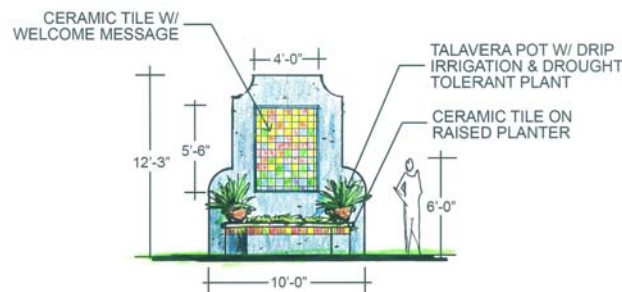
SMALL ENTRY MONUMENT ELEVATION
